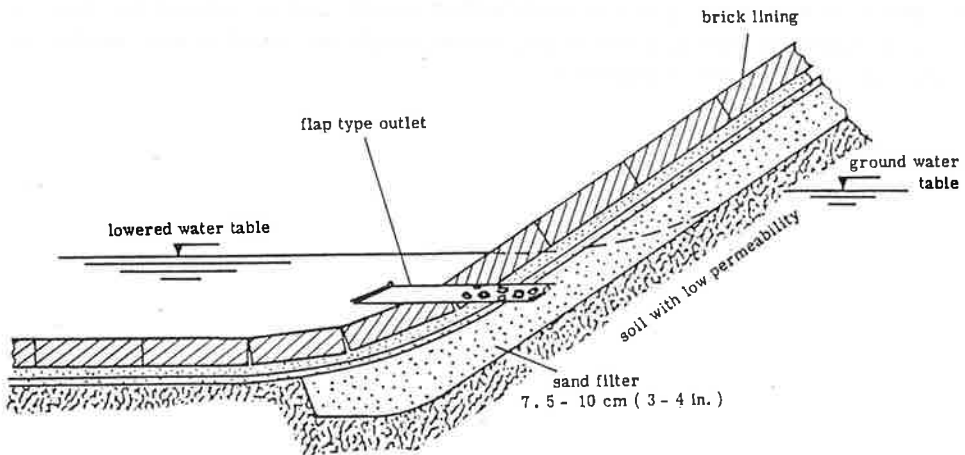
Drainage Arrangement for Brick Lining in Soils with Poor Permeability.
